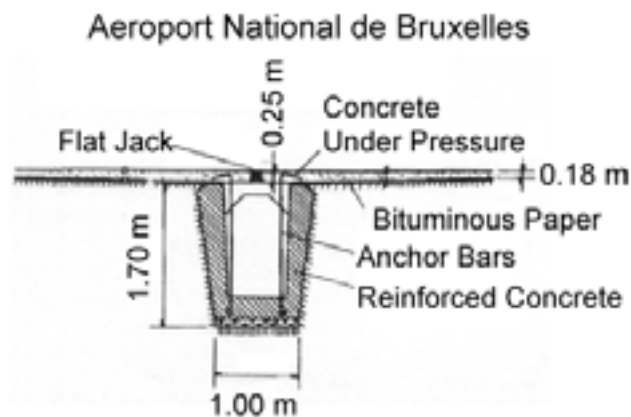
Cross-section through active joint used with the post-tensioned runway in Brussels, Belgium
